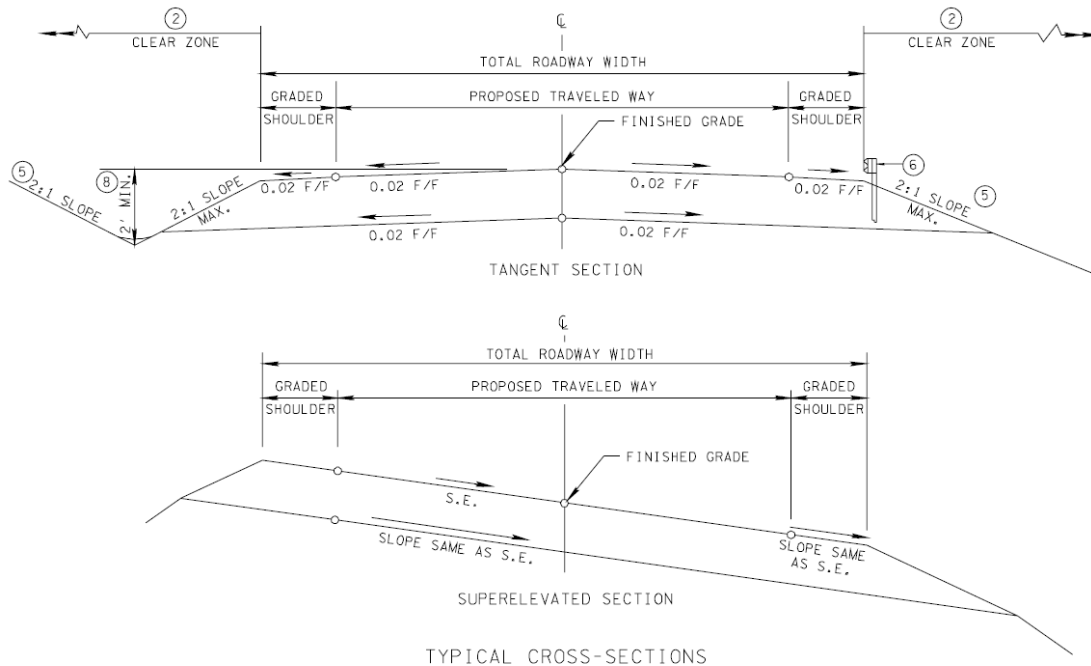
TDOT Typical Sections (Total Roadway Width – 18-20')
